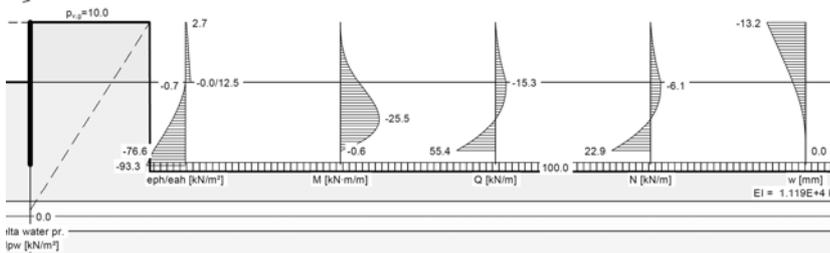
Example of excavation stability analysis without anchors next to Hites building
